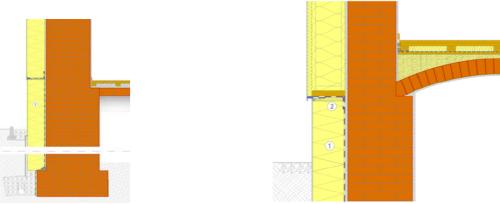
Example of a refurbishment detail: detail with 2 variants for a building built before 1918 with solid brick outside wall and vaulted ceiling (Notice: Variant basement floor insulation is insulated on the perimeter only at those parts of the basement wall which are in contact with outside air.)
